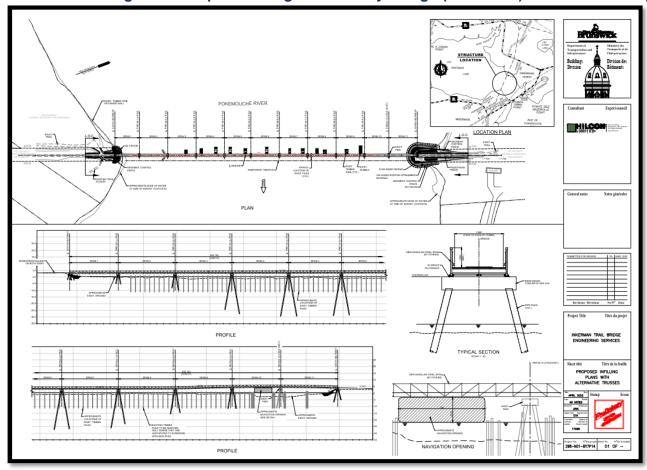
Figure E: Proposed Bridge Preliminary Design (Hilcon Ltd)
